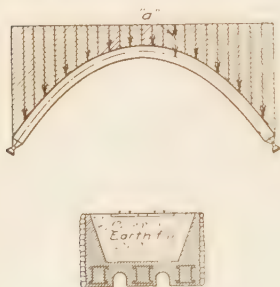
Method of loading which produces a "Catenarian" thrust line.
